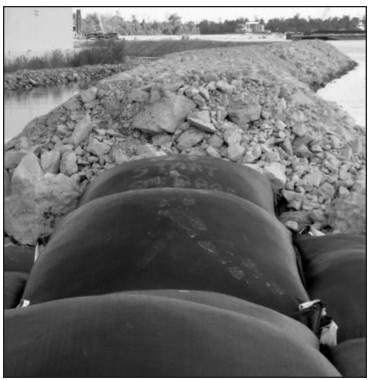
, 6 and 7 show construction of the berm. Figure 8 is an aerial view of the completed berm adjacent to the T-wall.
